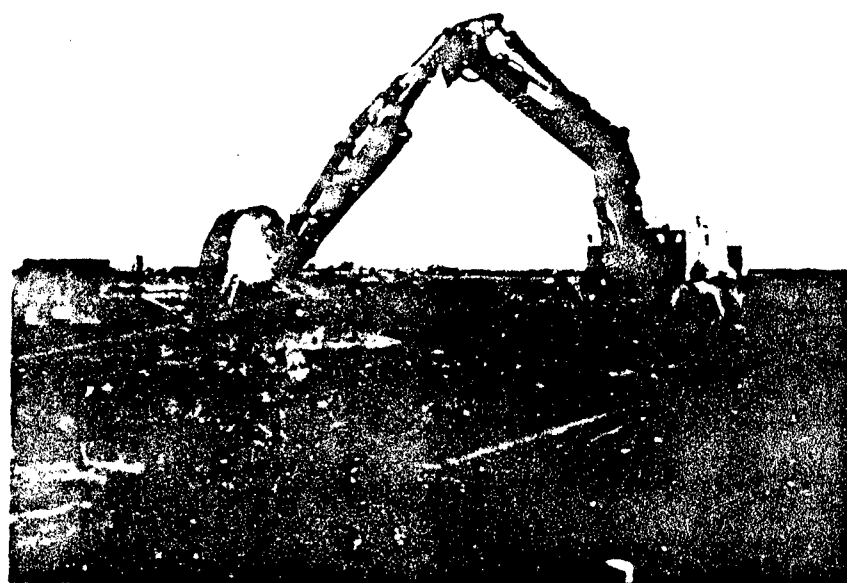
WEST END SLURRY TRENCH W/ DOZER
